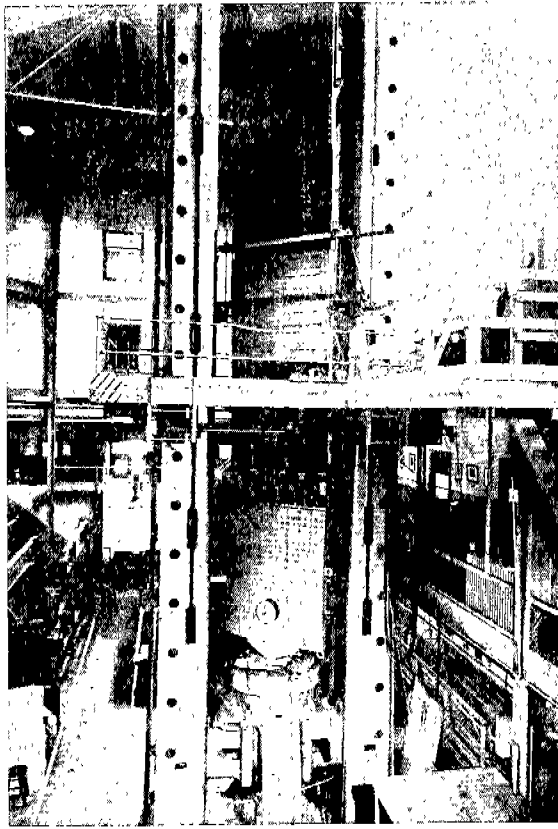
SIX-FOOT WIDE SPECIMEN MOUNTED IN 3,000,000-LB TESTING MACHINE
